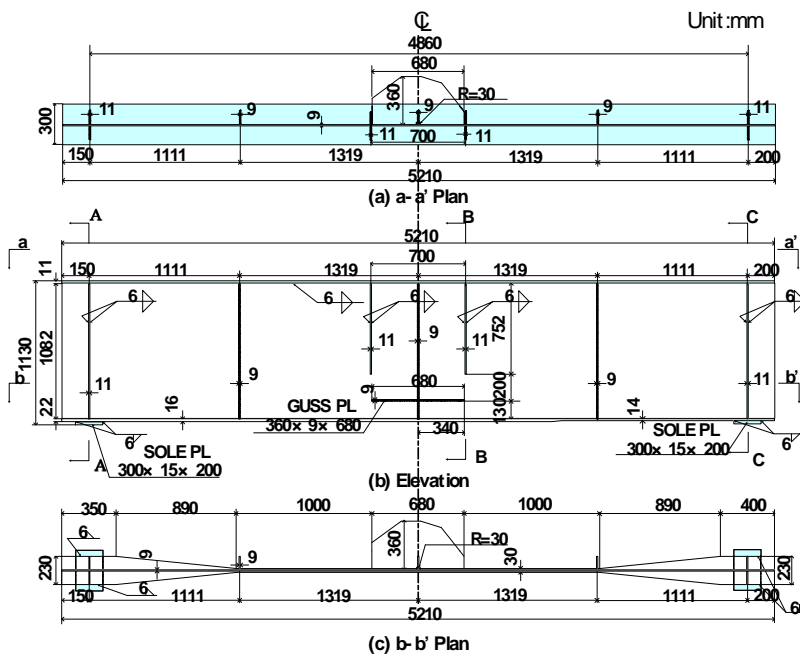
Configurations and Dimensions of G1 Girder Specimen
